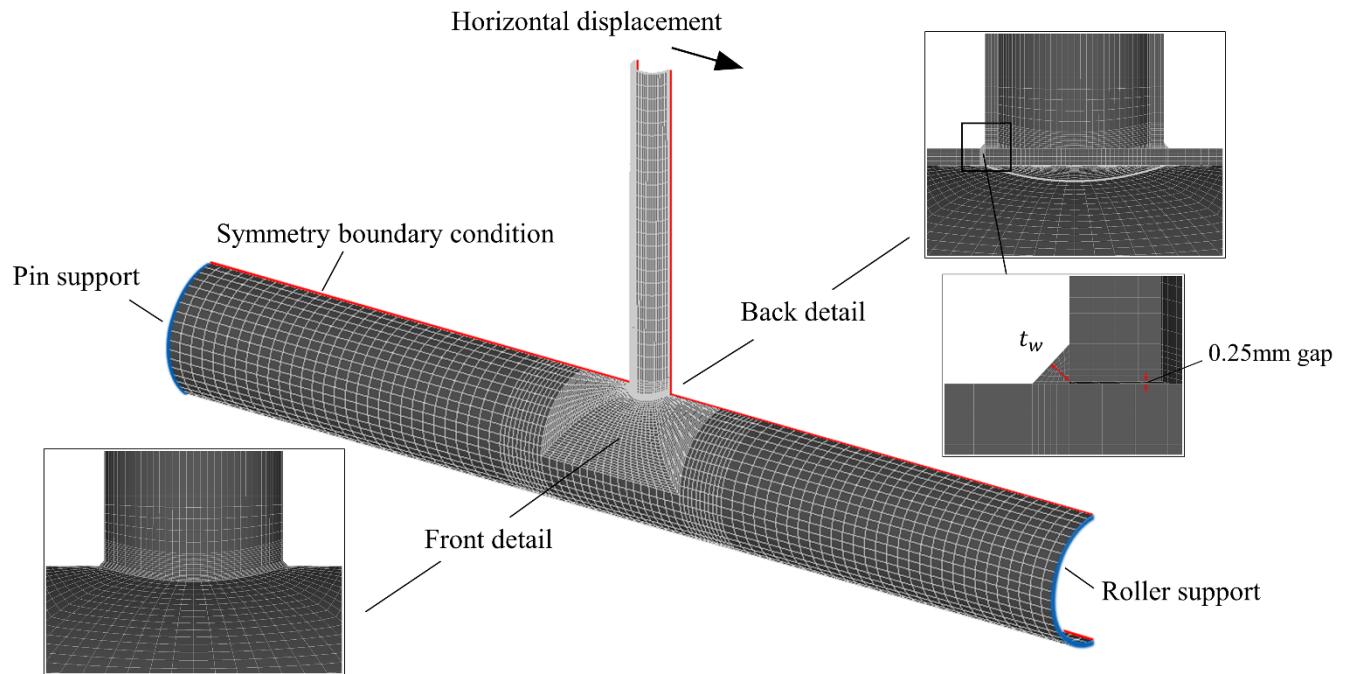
FE details of T406-127-0.7F (Fillet weld)
